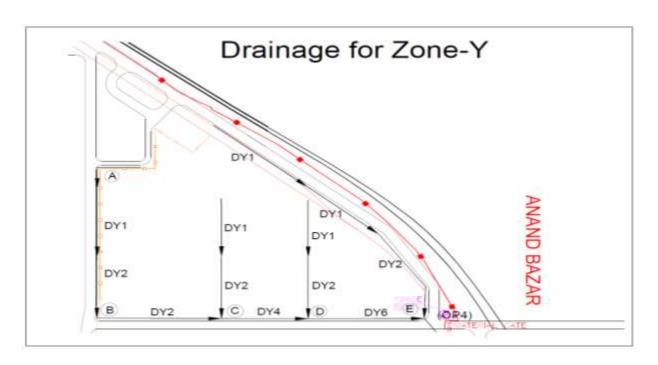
Y Zone drainage plan showing drains, longest flow path and outfall location
